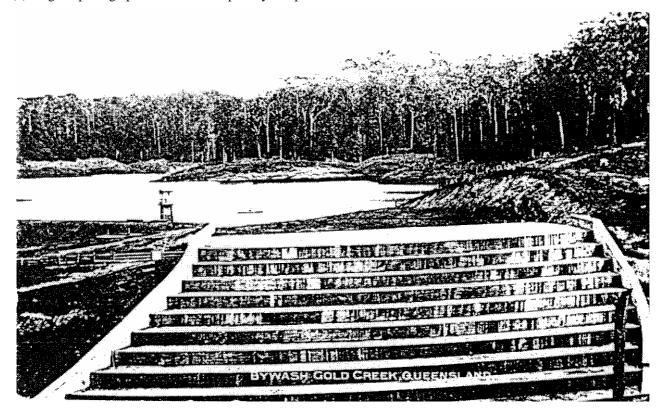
Photograph of the Gold Creek dam spillway (taken on 4 April 1996) Stepped spillway (view from downstream)
